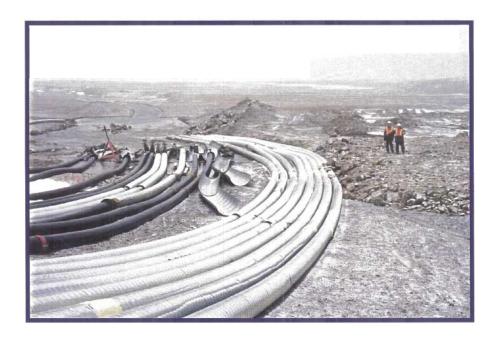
Discharge end of siphon pipes at downstream toe of Garrow Lake Dam. Garrow Creek flows in natural channel in background.
